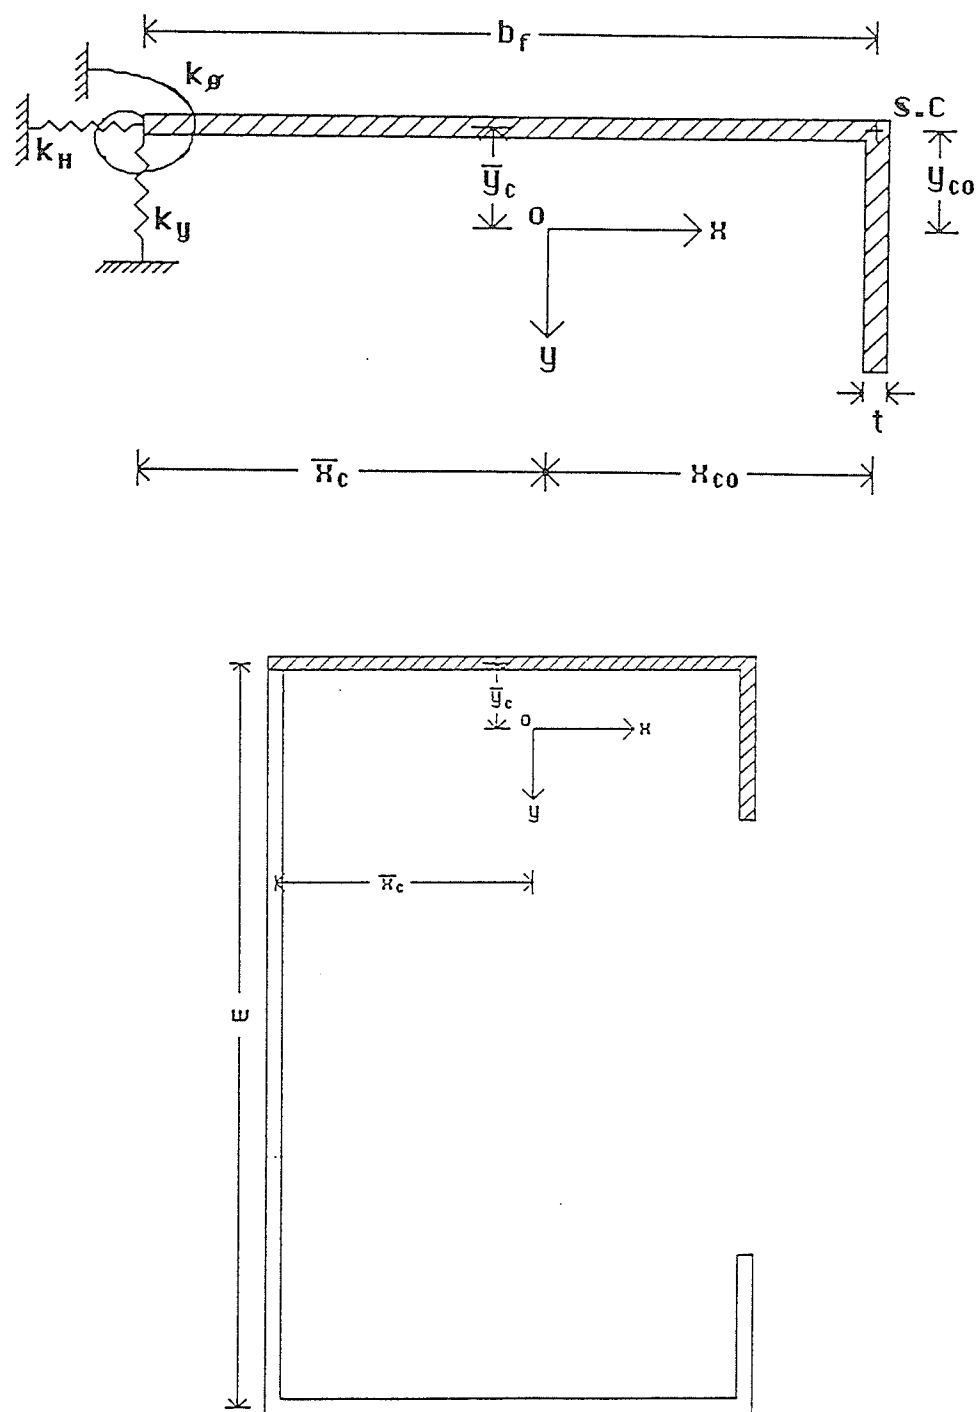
Flange-Edge Stiffener Component on a Continuous Elastic Foundation
